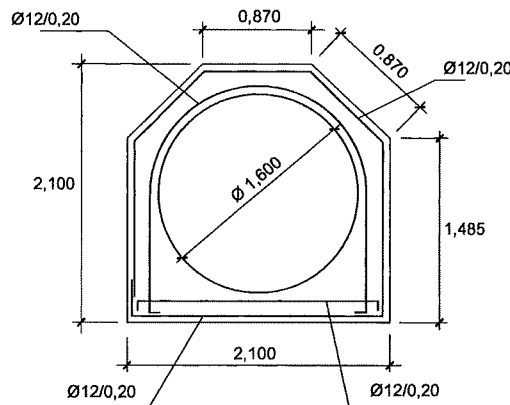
Concrete block with chamfered corners. Characteristic cross-section, with reinforcement (BR 8)
